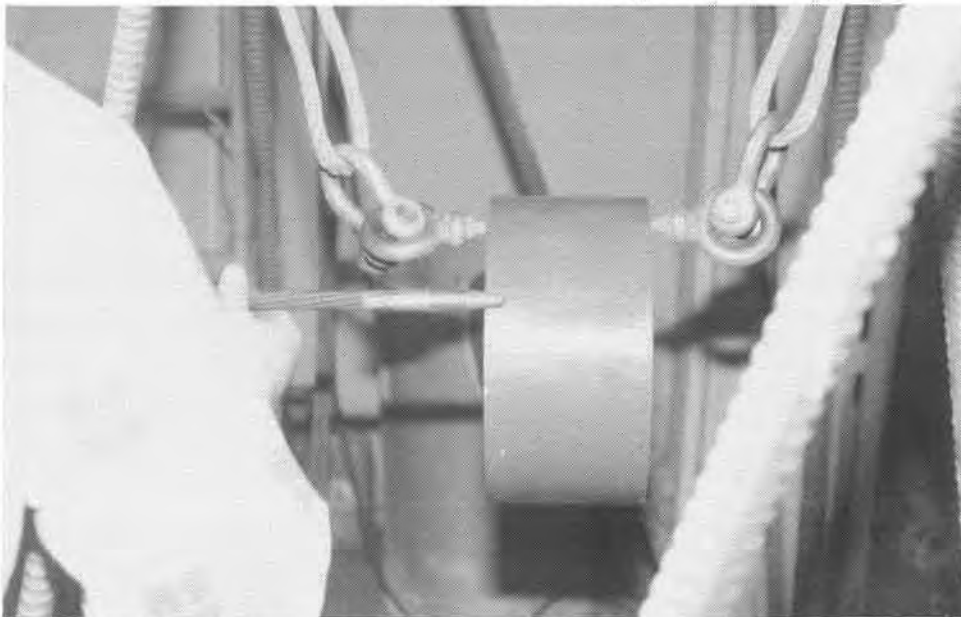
Hollow steel "bullet" to aid strand in passing through pipe assembly untangled
